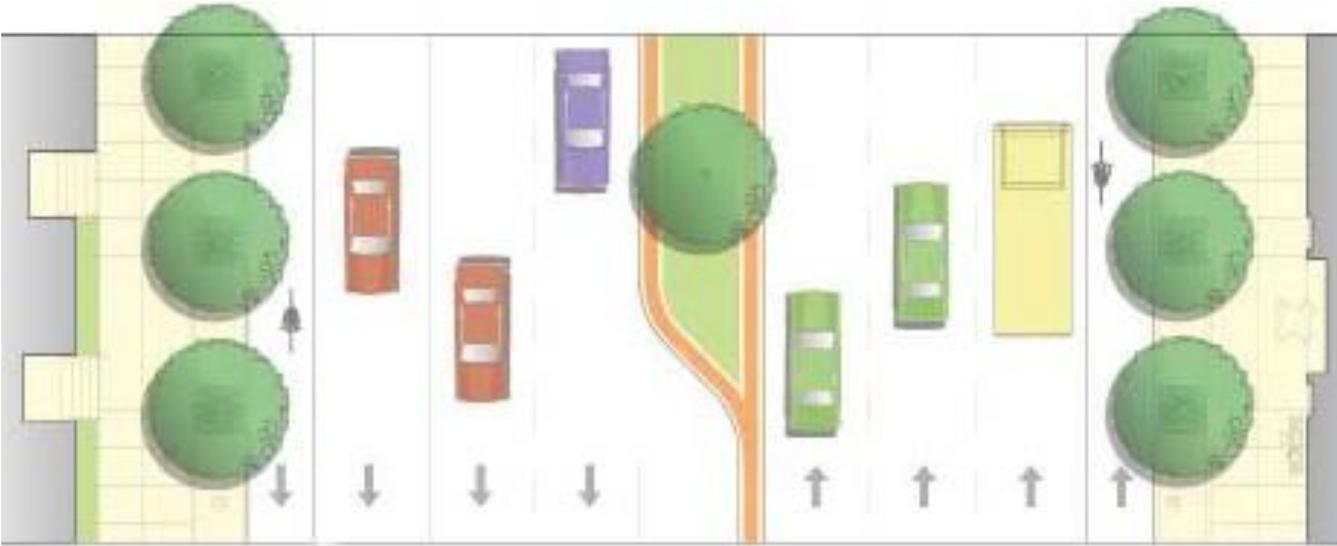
Near-Term Alternative, Watt Avenue Concept Plan
